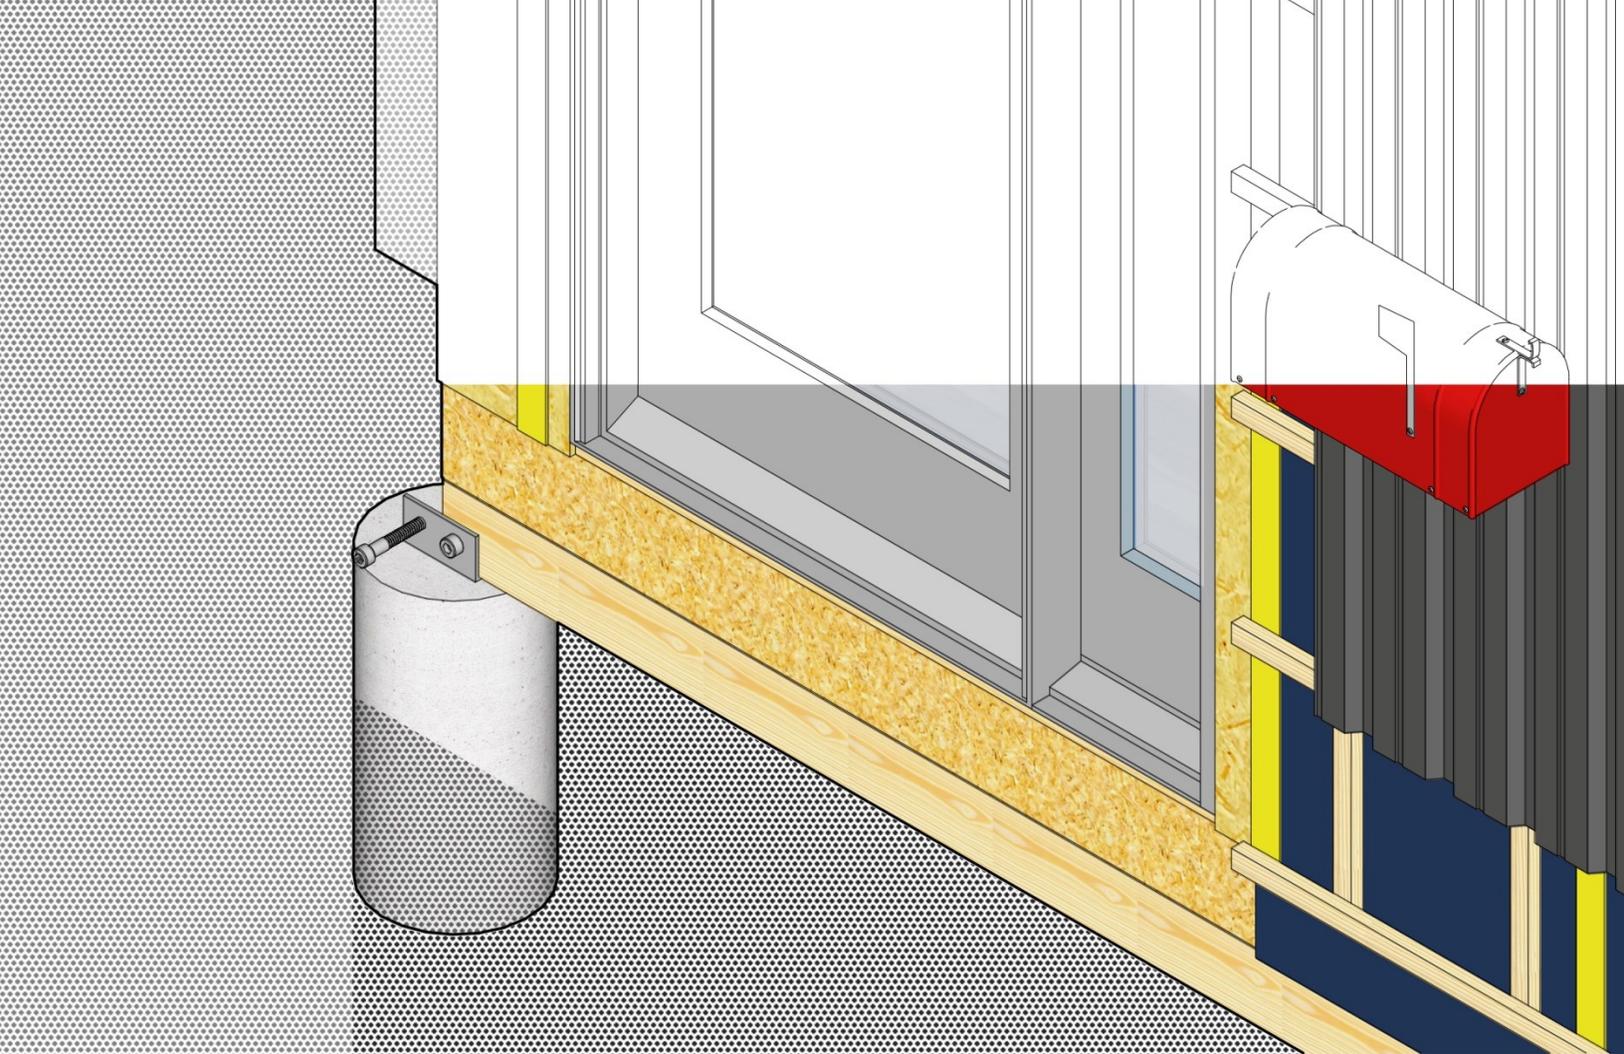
Possible variation of foundation methods based on site conditions – In this situation the diagram shows a concrete pier foundation & connection detail
